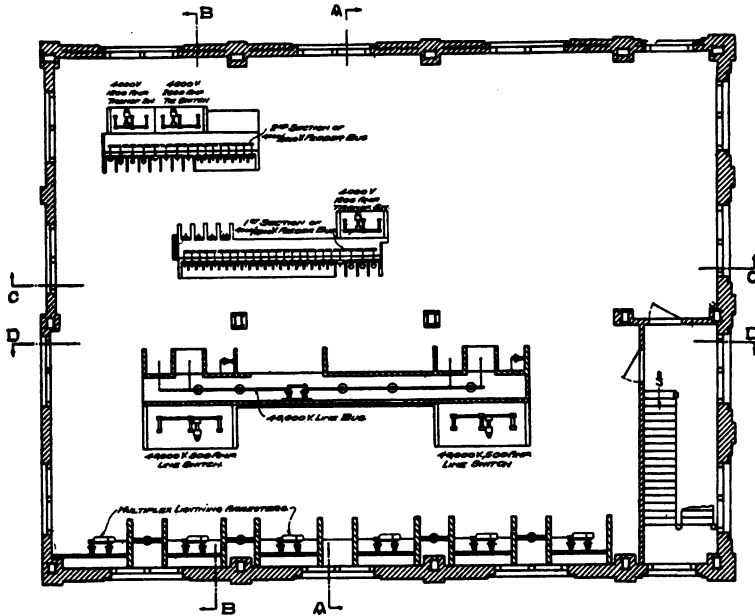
Third Floor Plan, Substation, Chattanooga & Tennessee River Power Co.
